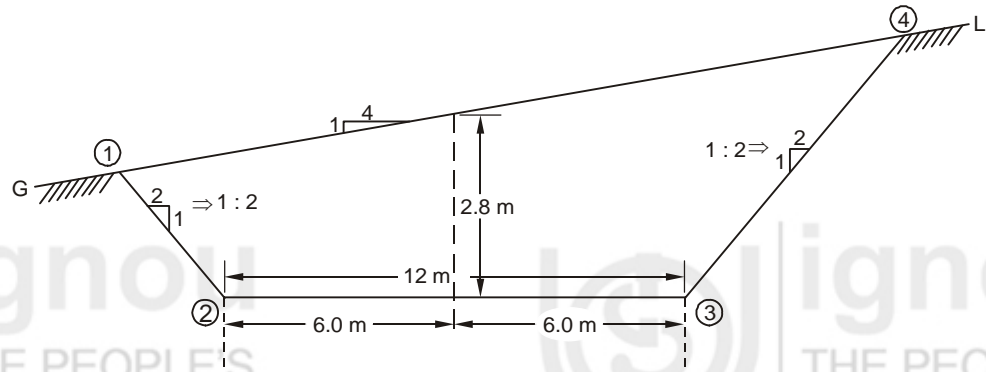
Given Cross-section of a Road Entirely in Cutting (Example 1.1)
